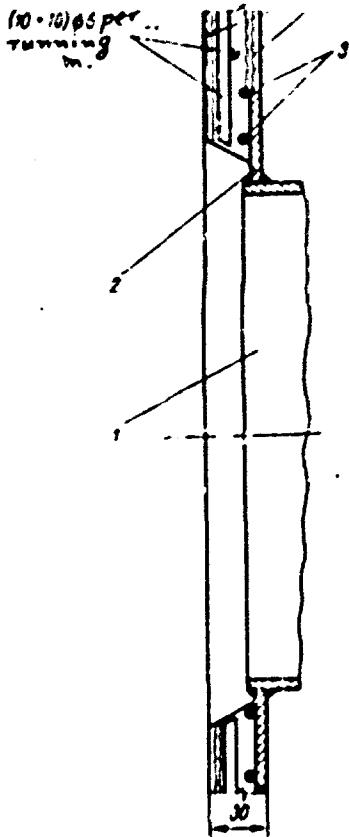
Attachment of Illuminating Device to Reinforced Concrete Sheathing with Aid of Inserted Sheets; 1- illuminator frame; 2- insert -6; 3- anchoring rods 6.
